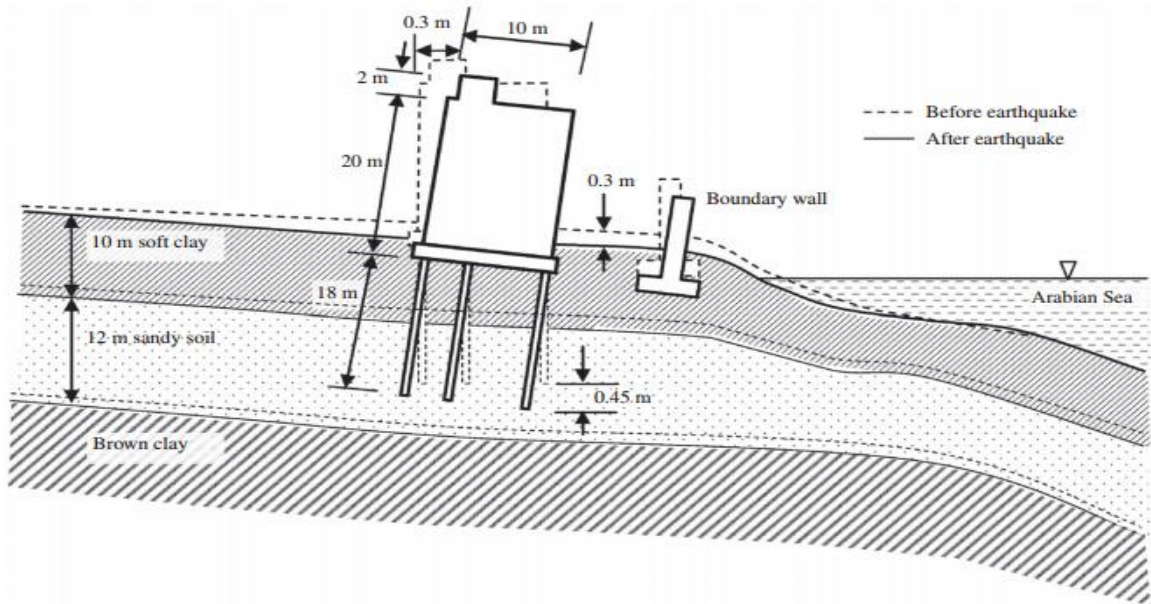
Plausible settlement mechanism of failure showing the tilting the Tower, assuming there is no structural failure of piles (Bhattacharya et al 2008)
